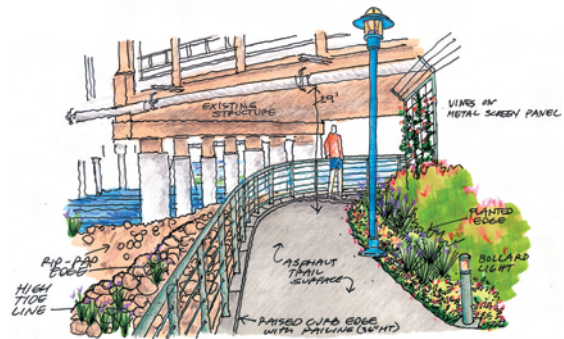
D.48: Sketch Concept of Trail Connection under the Causeway Overpass Looking North
